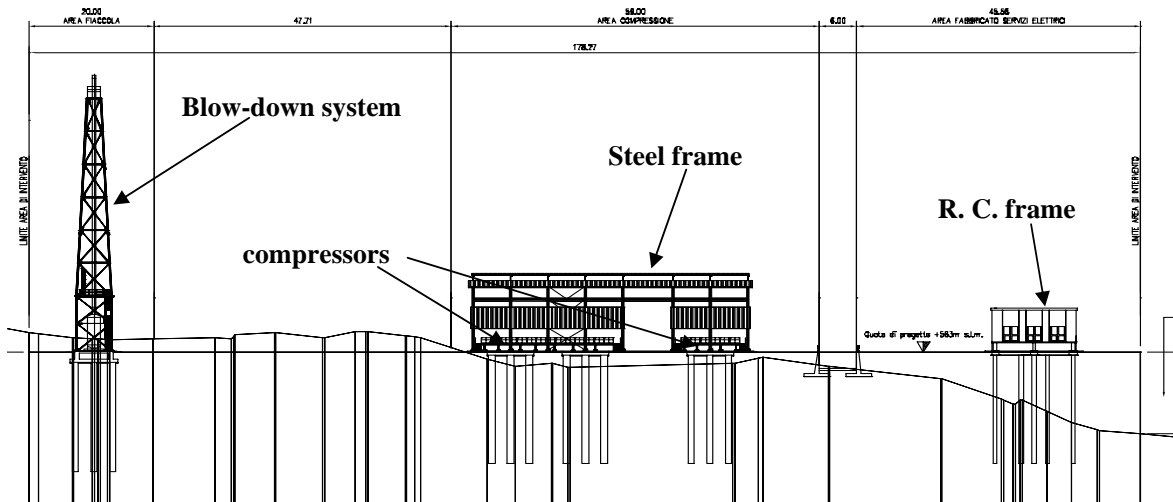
Section view of the new facilities to be constructed into the gas power plant.
